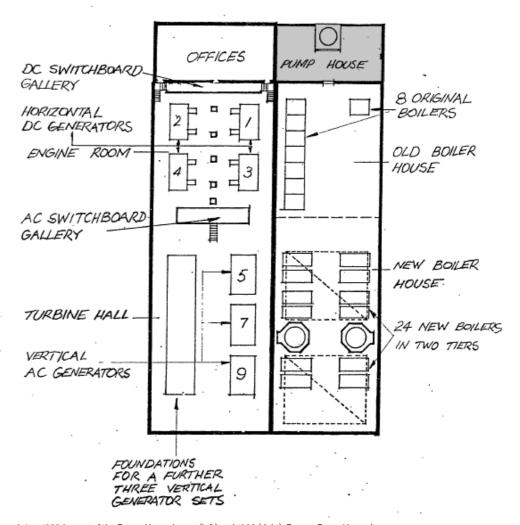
1899 Layout of the Power House layout (left) and 1902 (right). Former Pump House in grey (Source: Godden et al. 1984 p. 98 & 104)
